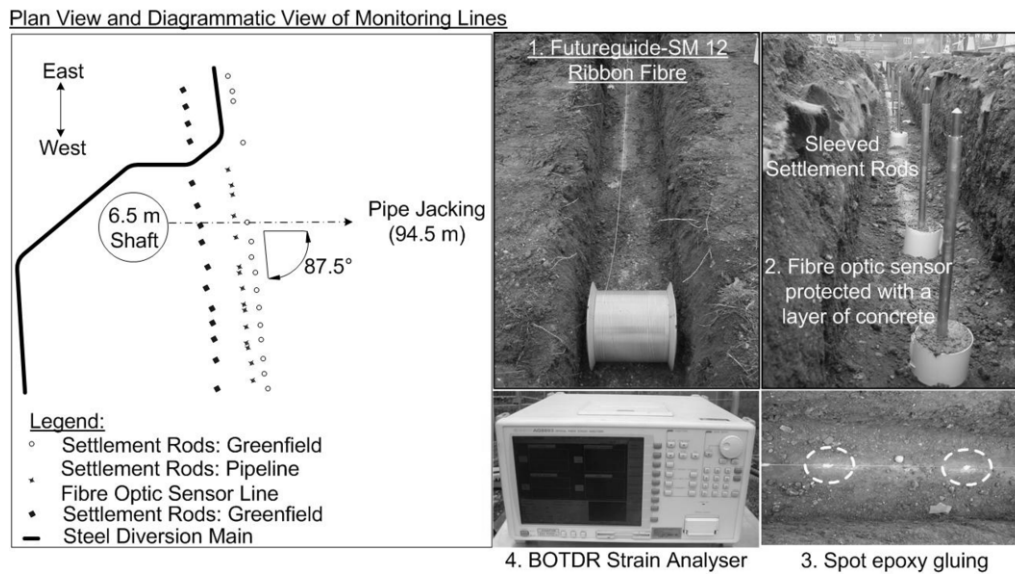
Instrumentation layout and photos of the sensor system during installation (Vorster, 2005).
